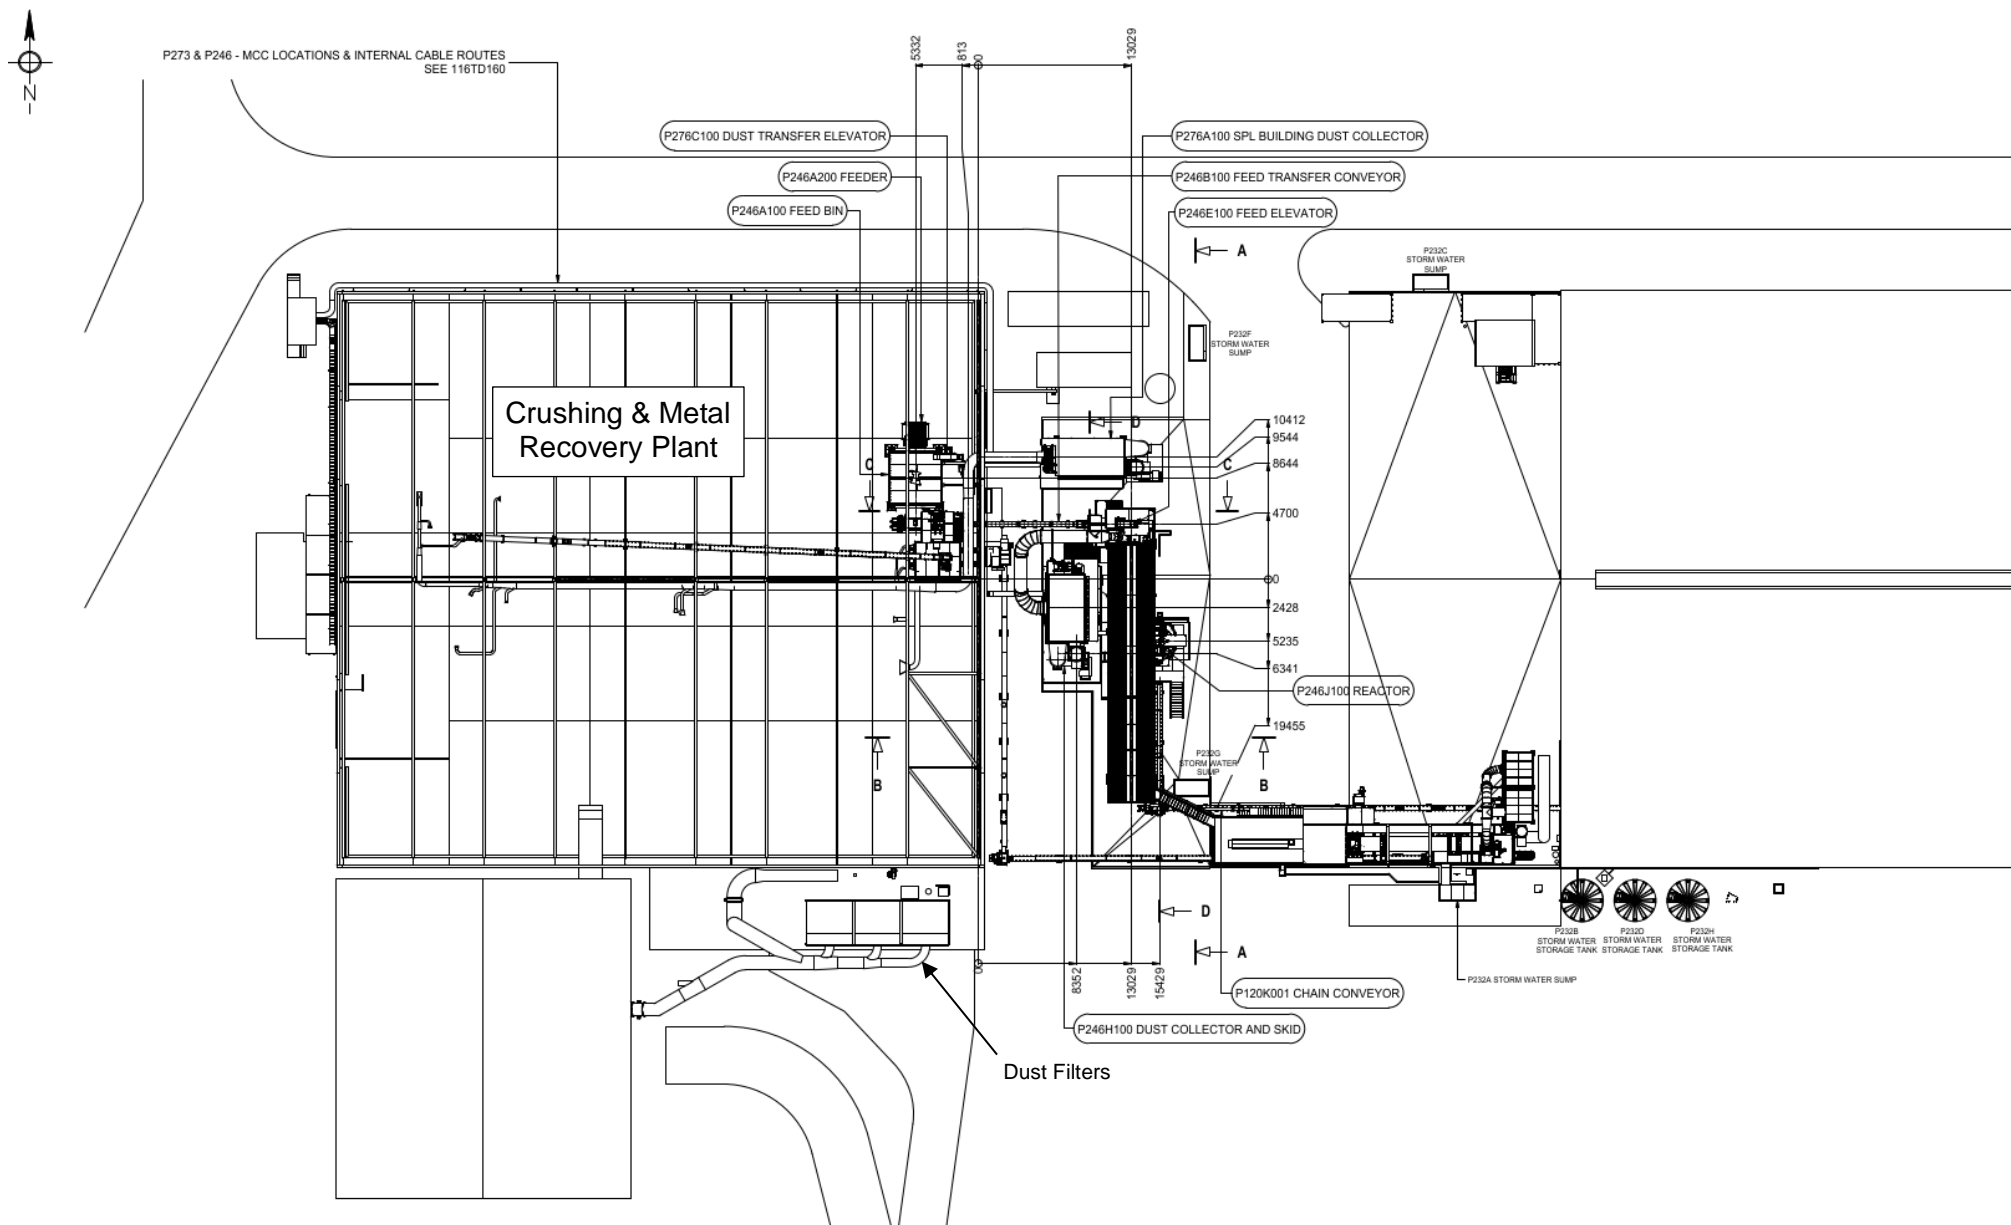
SPL Plant Layout showing Major Equipment Locations
